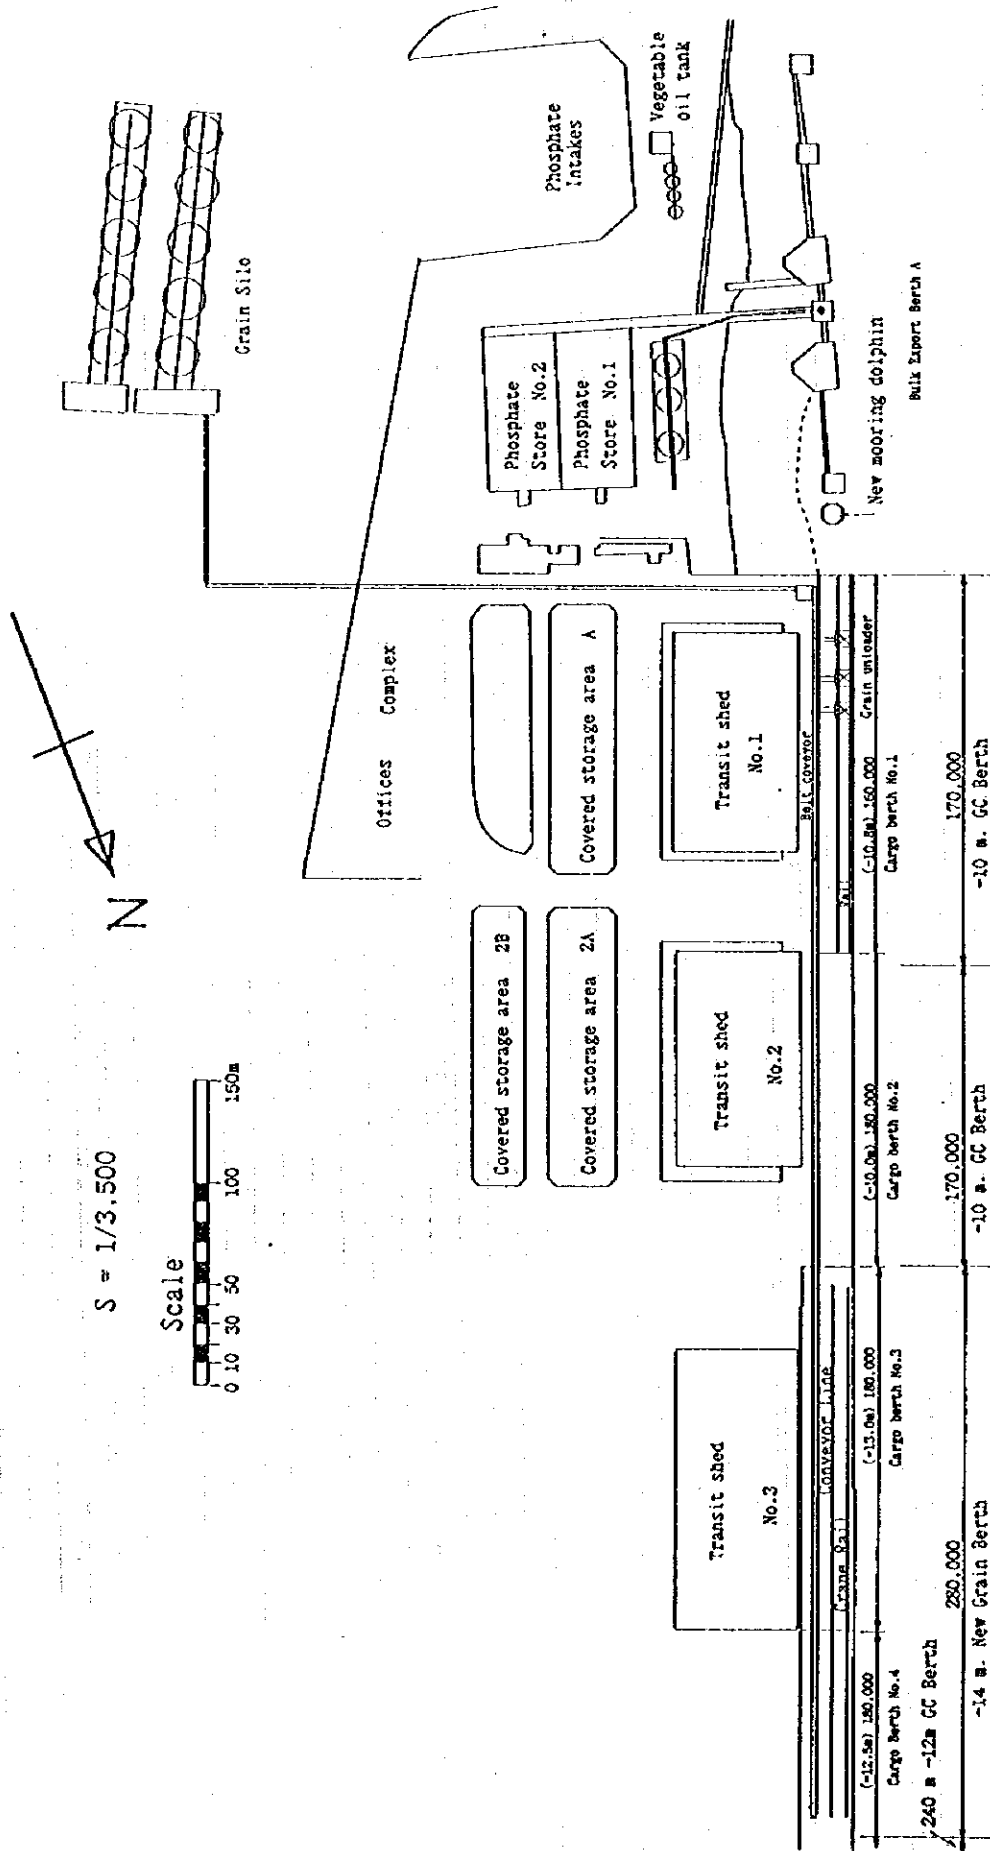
(2) Facility Layout of New Grain Berth (Alternative 2)
